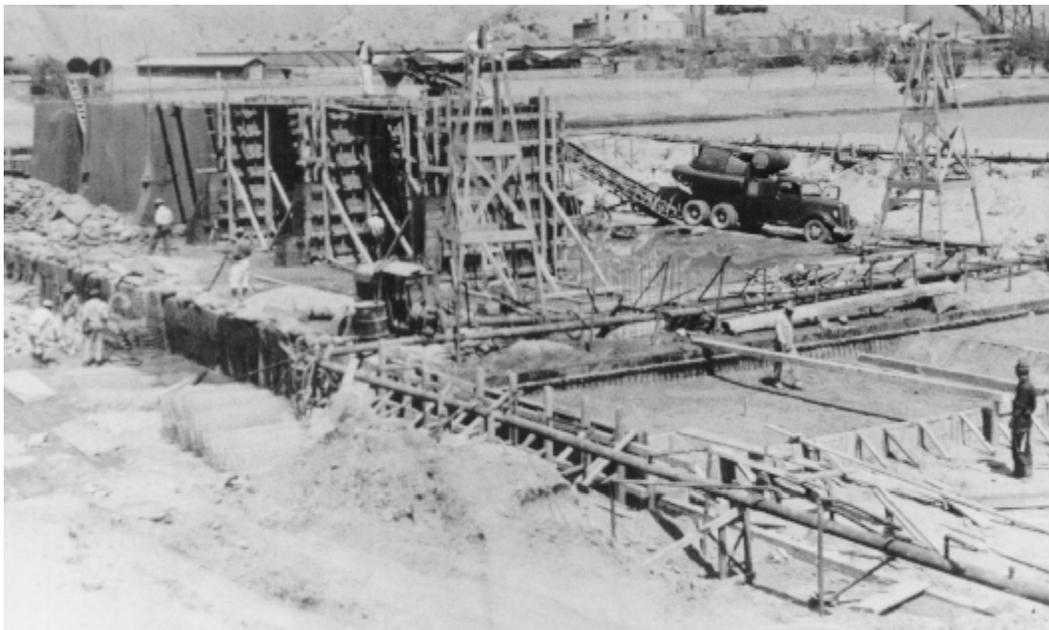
Pouring Concrete in Pier 5, American Dam, 19 April 1937.
